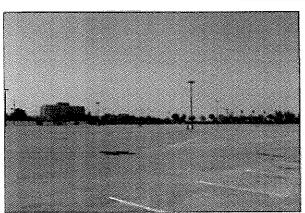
View of the stadium site, looking northwest from Centenrial Boulevard.
